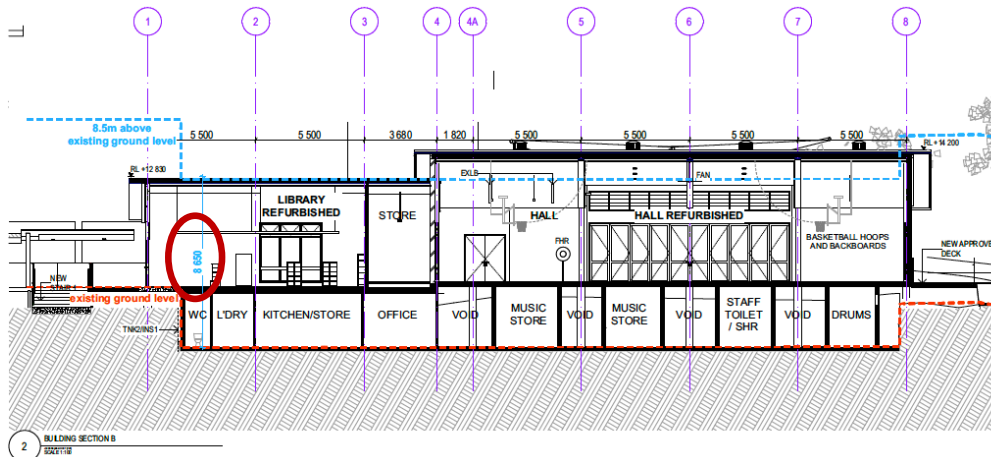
Extract of section depicting maximum height of 8.65m (existing height)
